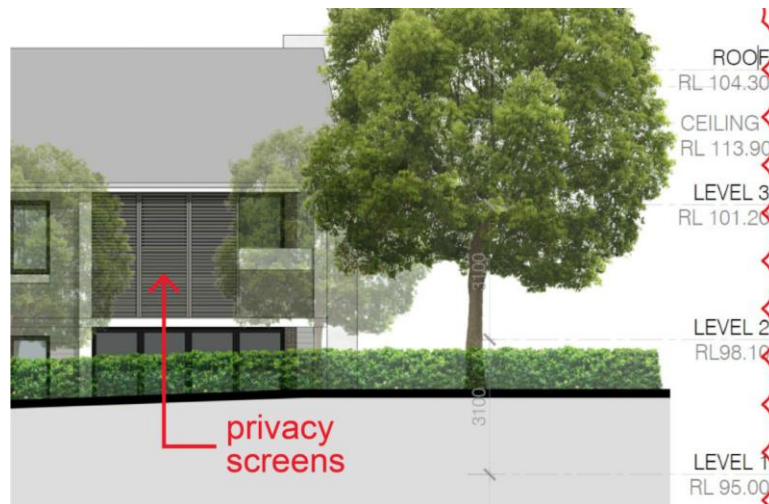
Extract from architectural plans detailing privacy screening to Block C where the contravention occurs. (Source: Hyecorp)
